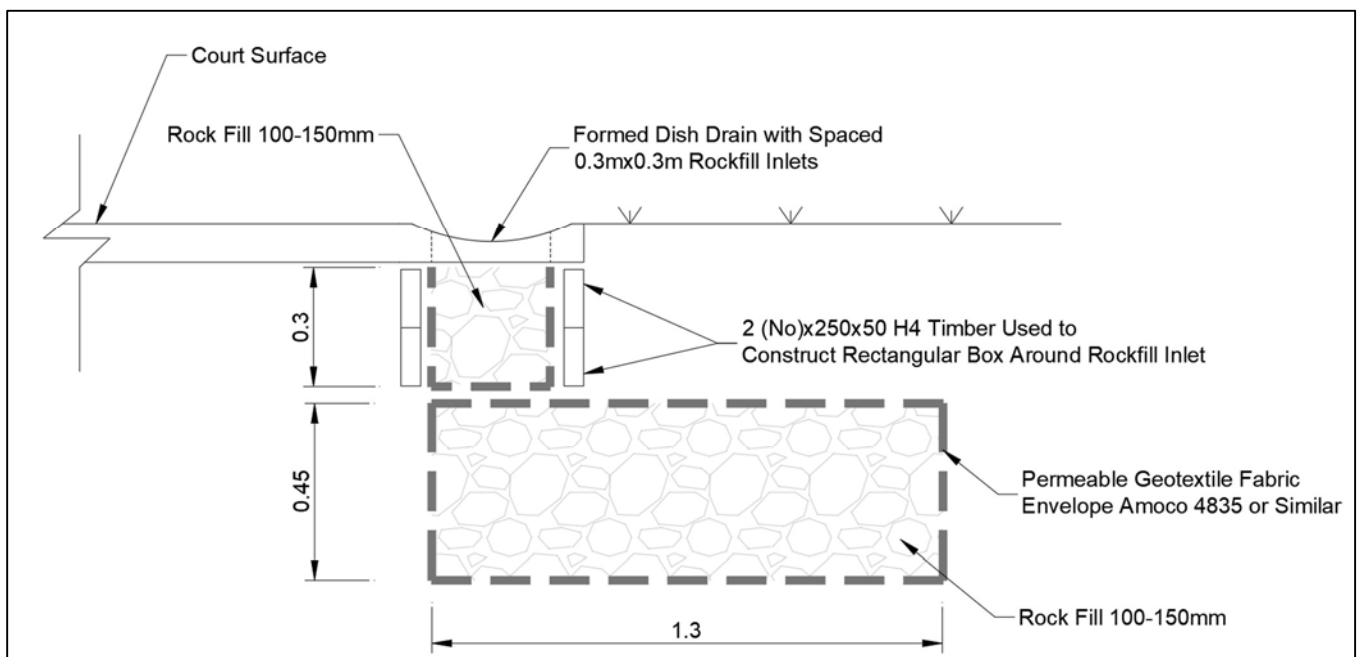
Soak Pit for Court Area – Rock filled (Cross-section View)
